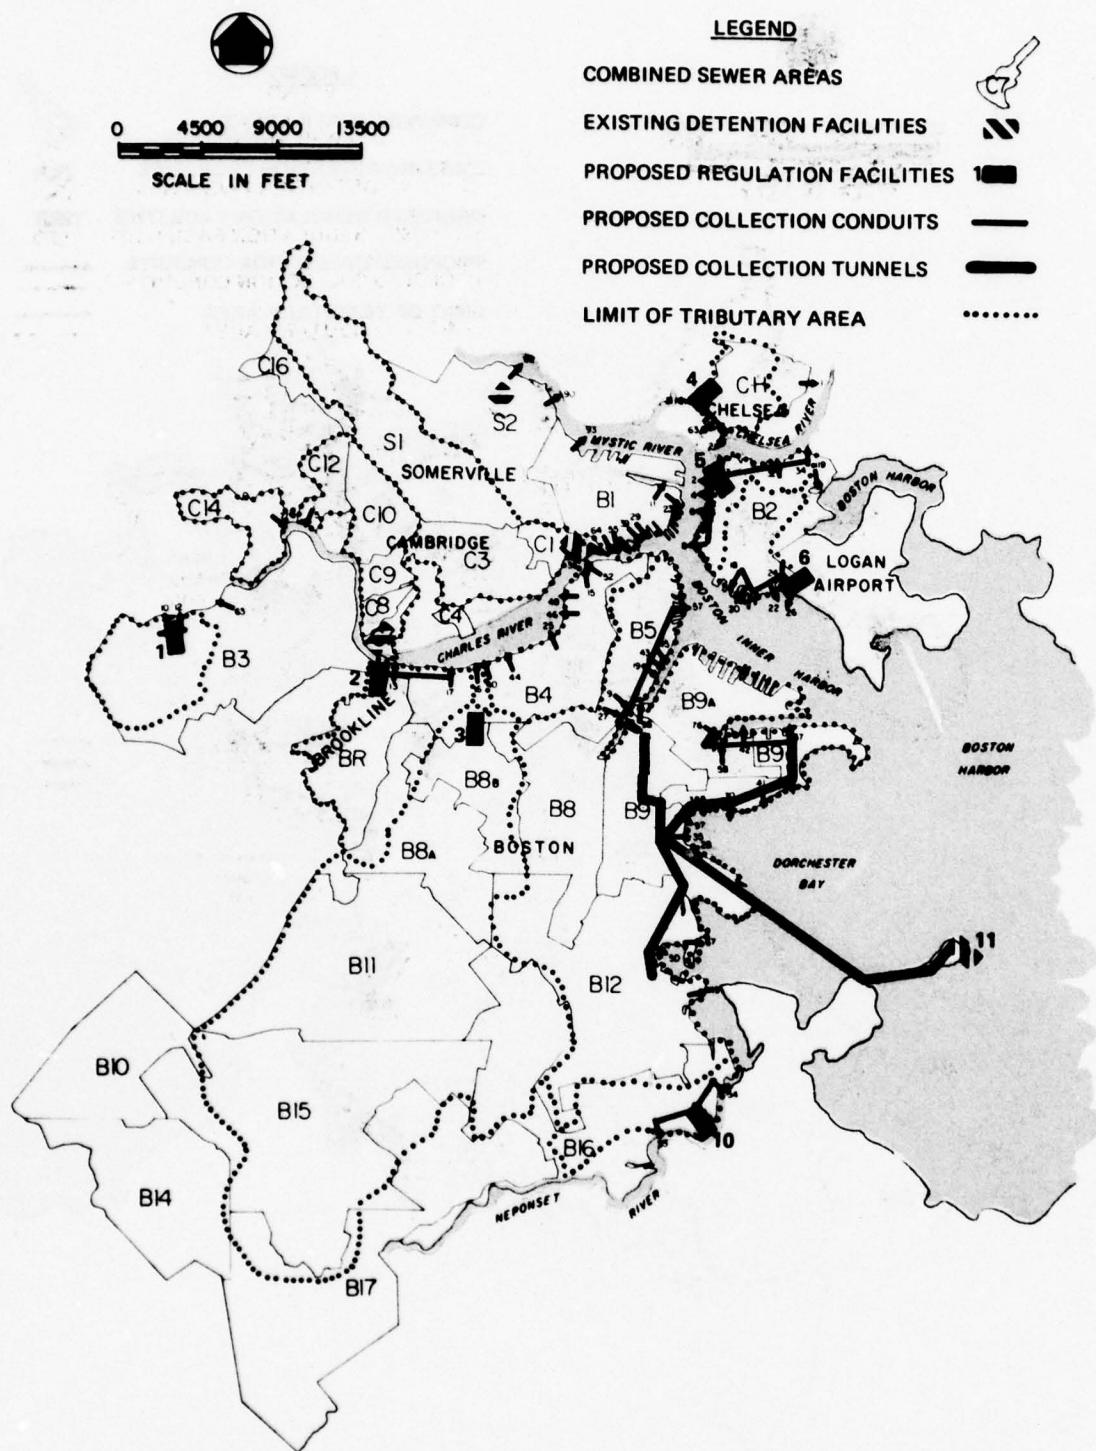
MOON ISLAND TUNNEL PLAN WITH SATELLITE REGULATION FACILITIES AND COLLECTION SYSTEMS IN ALTERNATIVE 2
